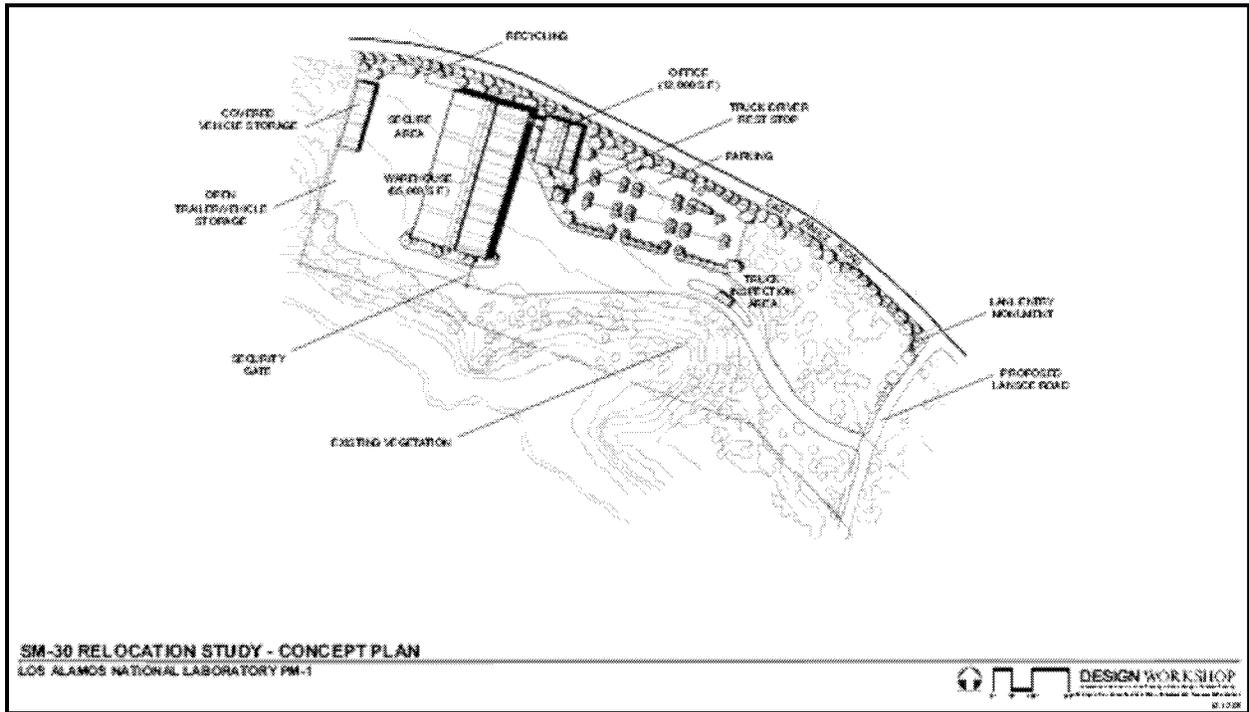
Technical Area 72 Remote Warehouse and Truck Inspection Station Conceptual Layout
